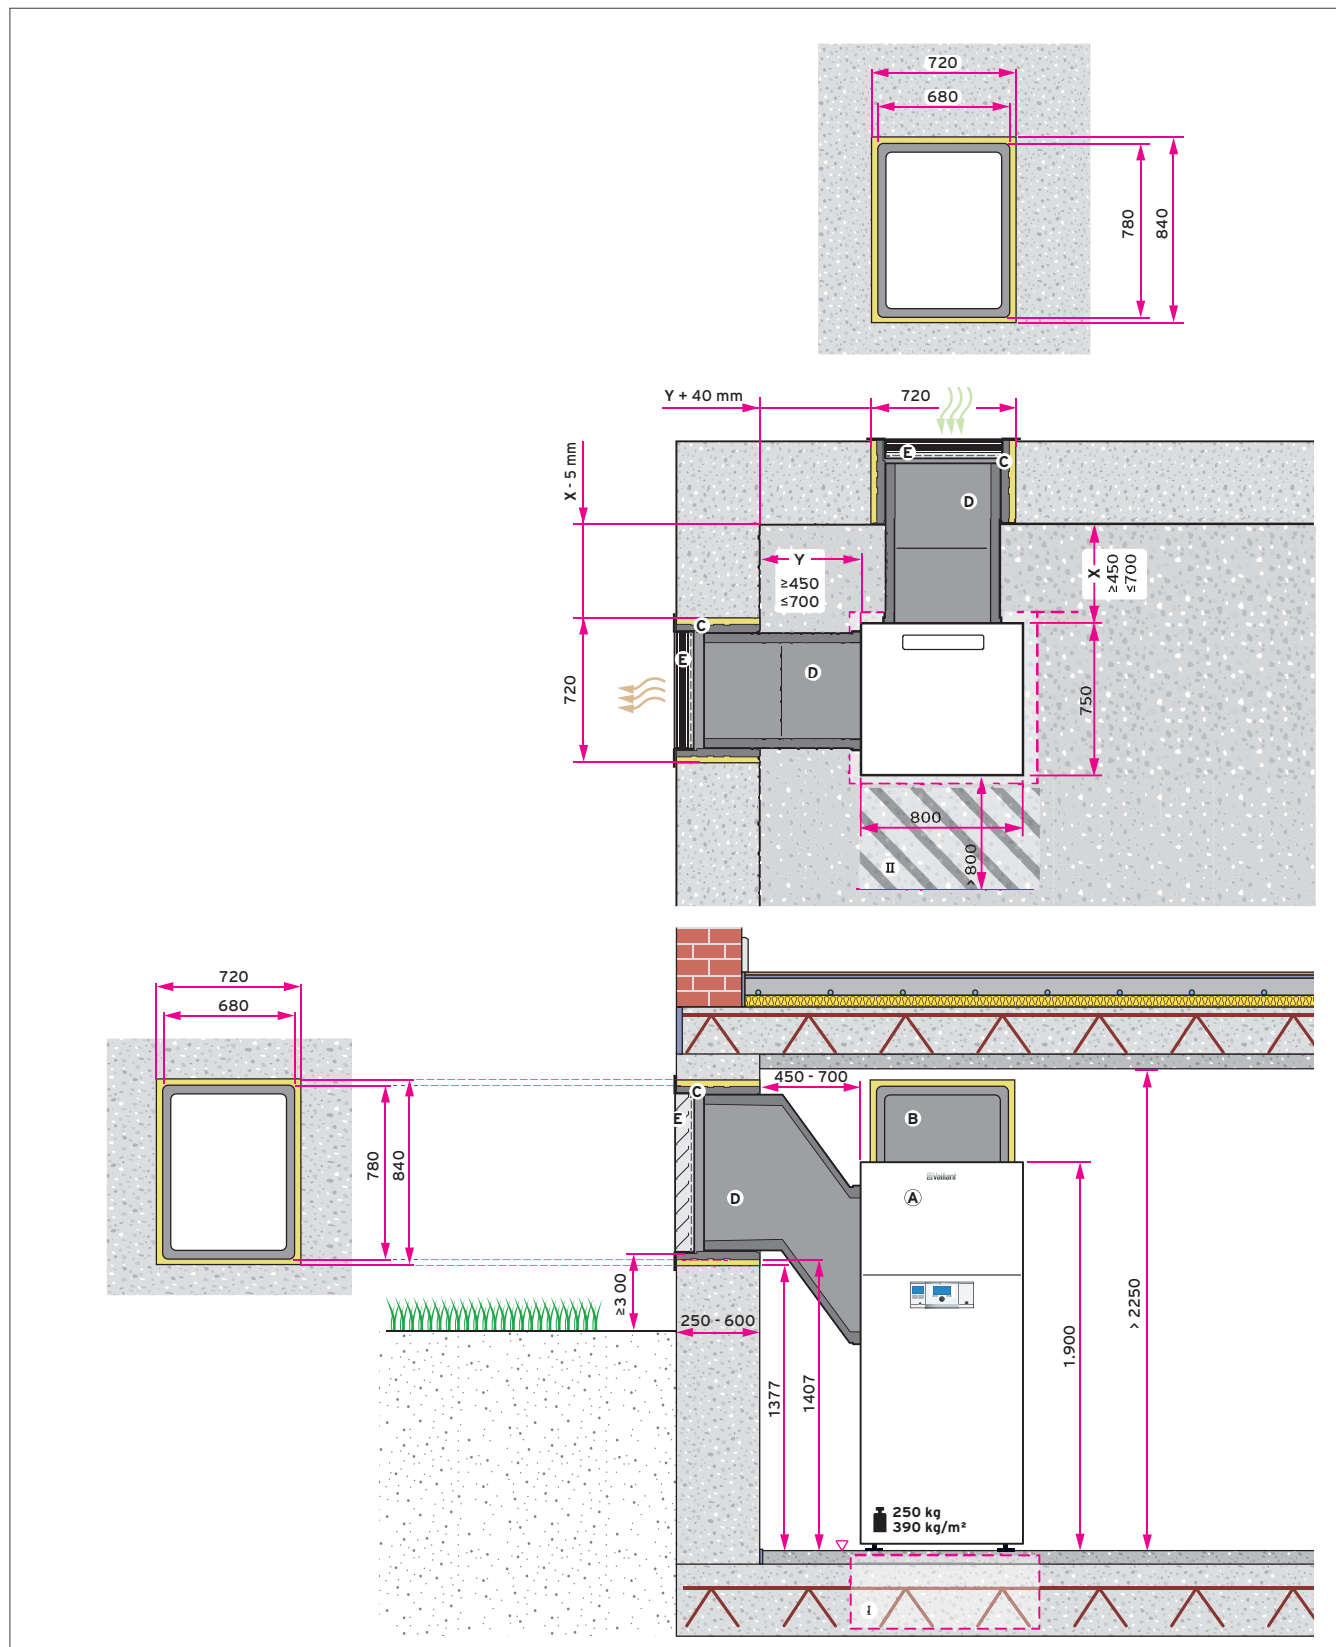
versoTHERM installation situation, ground floor - left-hand installation in the corner of a room with cellar adapter
